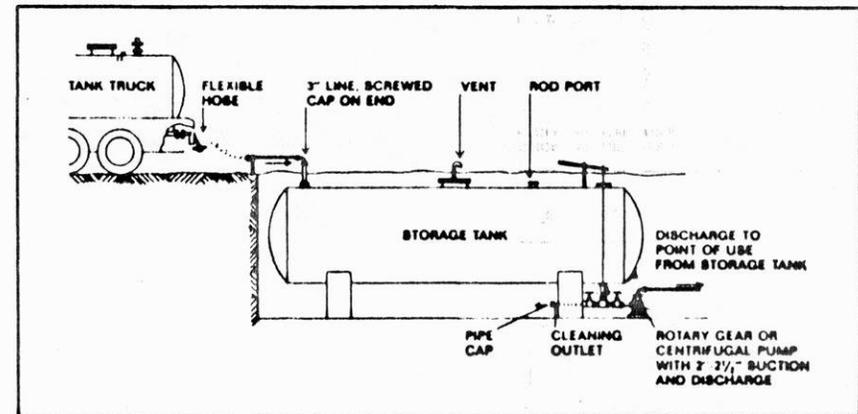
UNLOADING AND STORAGE LAYOUT
